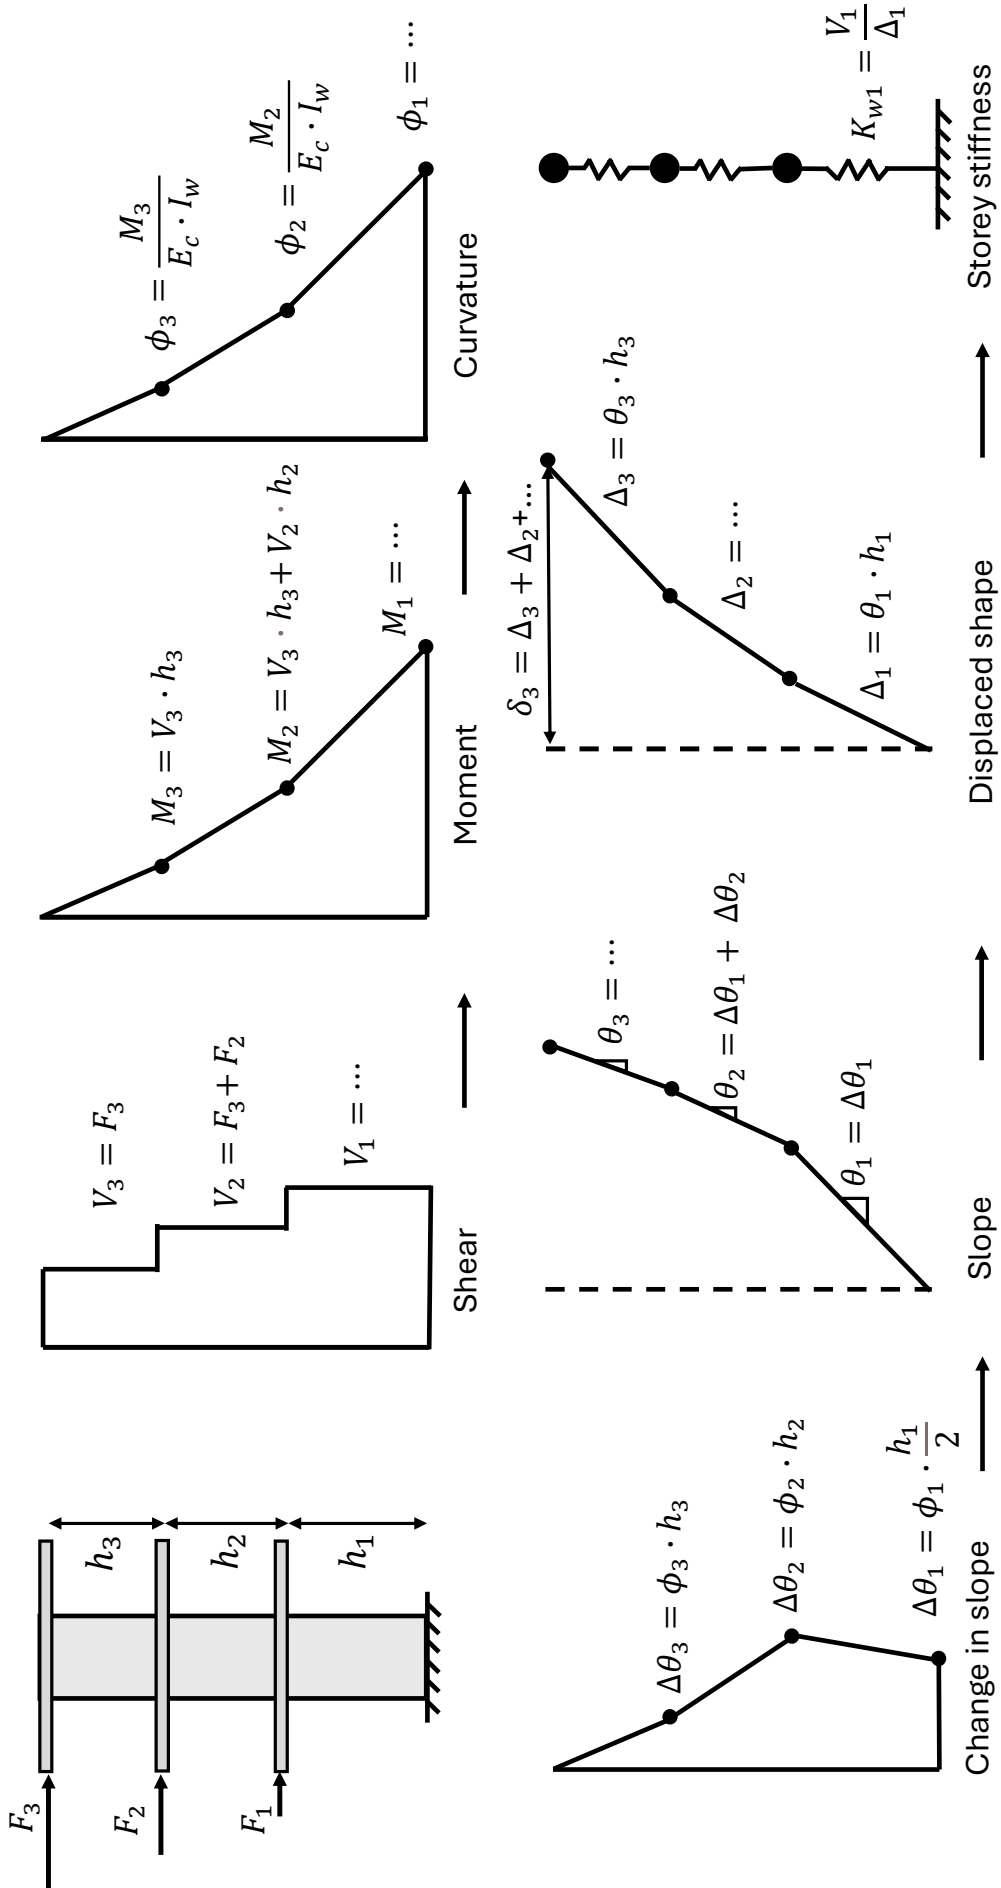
Illustration of procedure for calculating effective storey stiffness of a wall and modeling the structure as a “shear building”.
